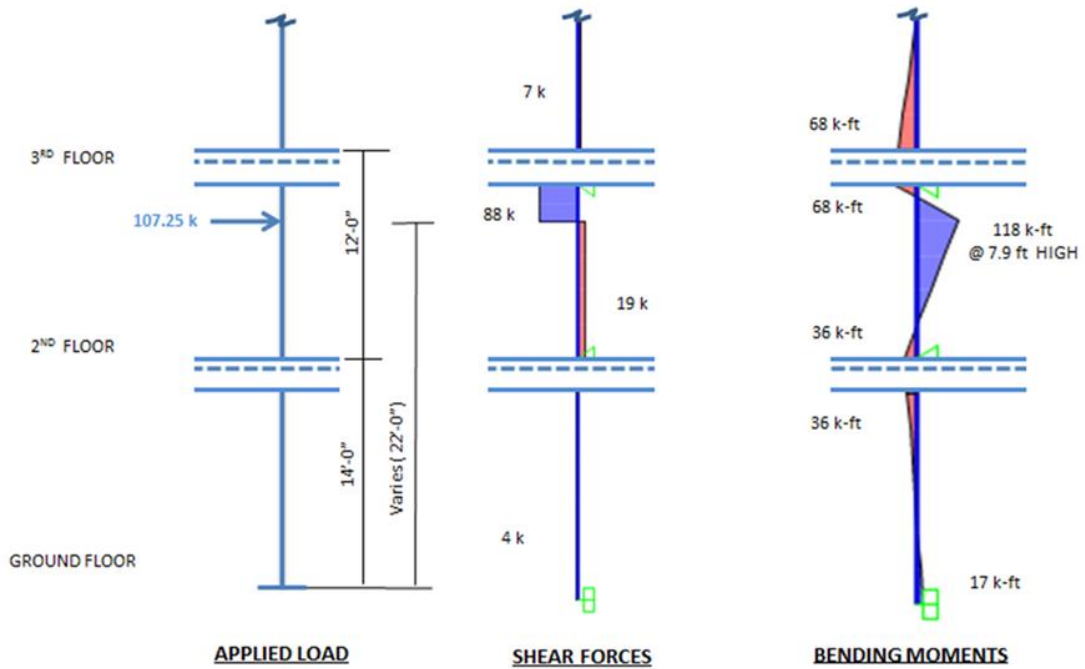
Impact load applied at "d" away from the end of column on the 2nd floor
